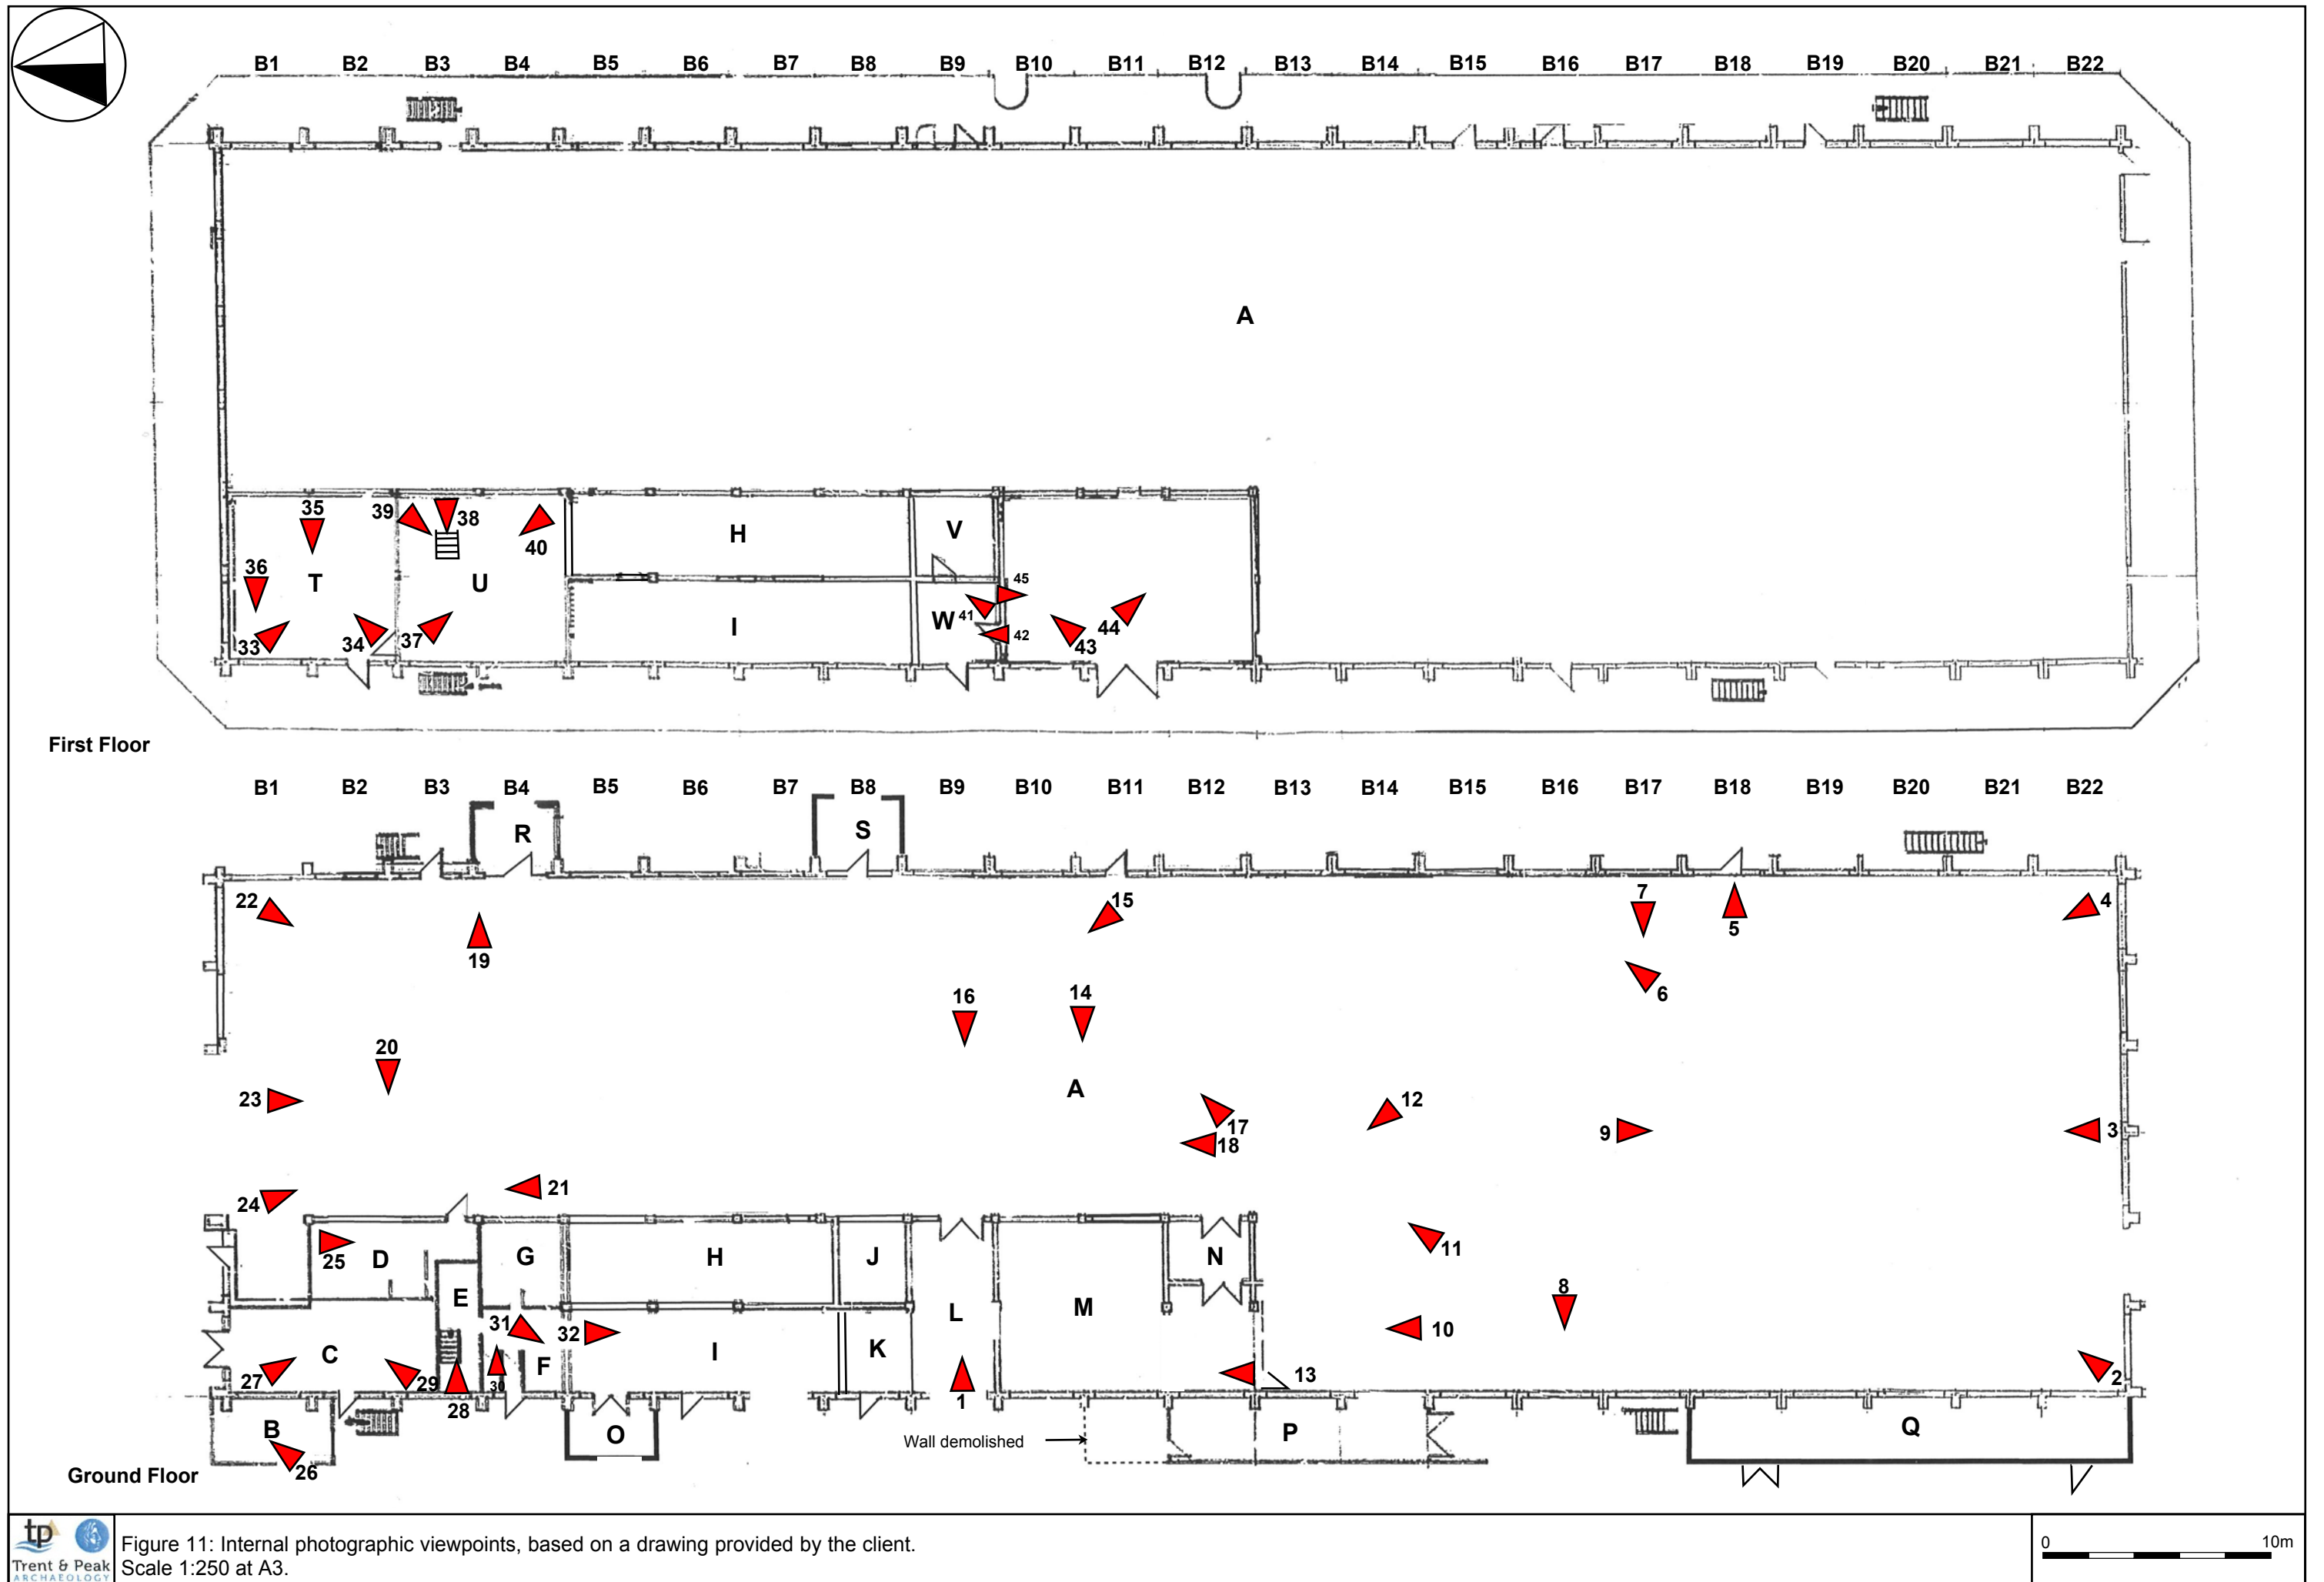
Internal photographic viewpoints, based on a drawing provided by the client.
